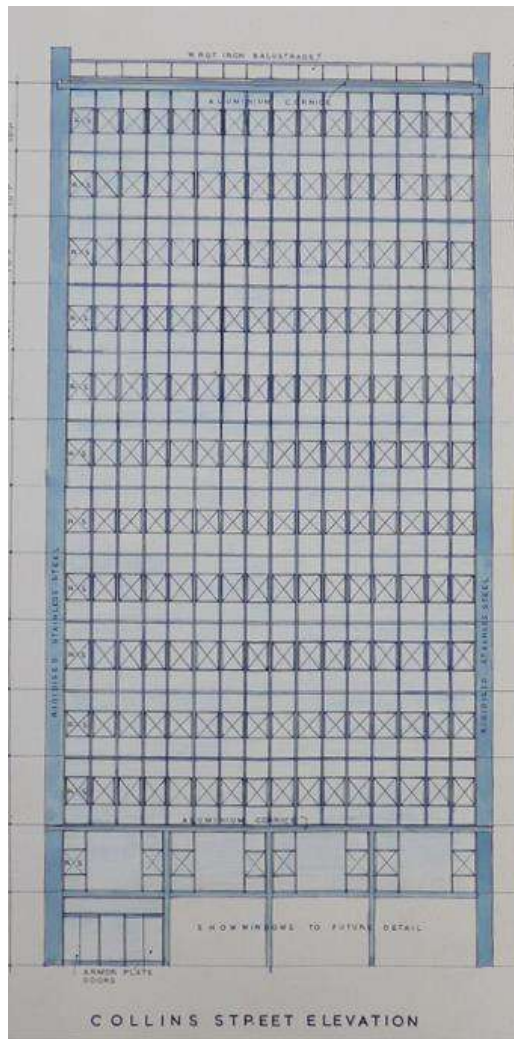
South elevation to Collins Street. Drawing by J A La Gerche, dated August 1957 (BAP).
